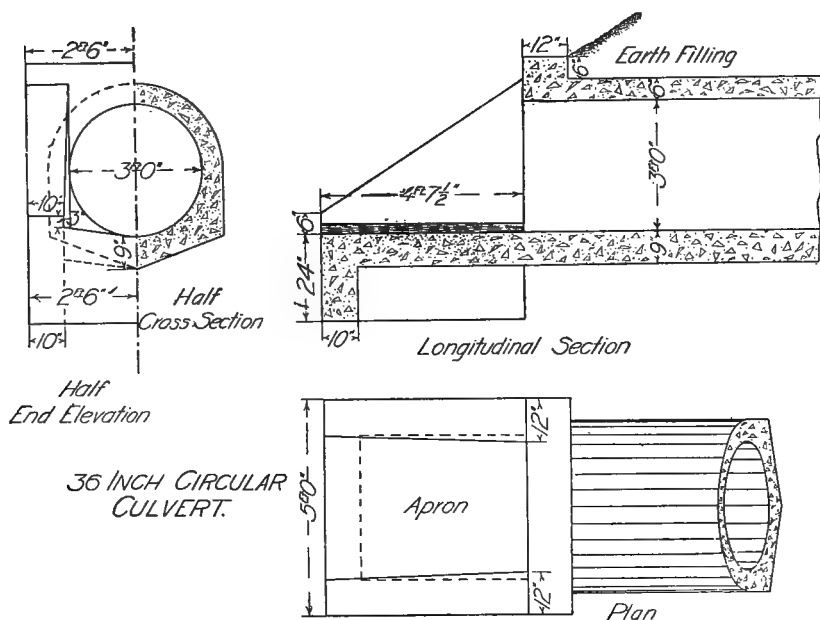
CONCRETE CIRCULAR CULVERT.
